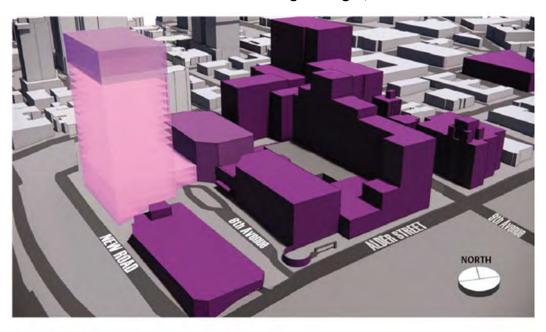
3D IMAGE OF EXISTING AND PLANNED NEW PATIENT TOWER
